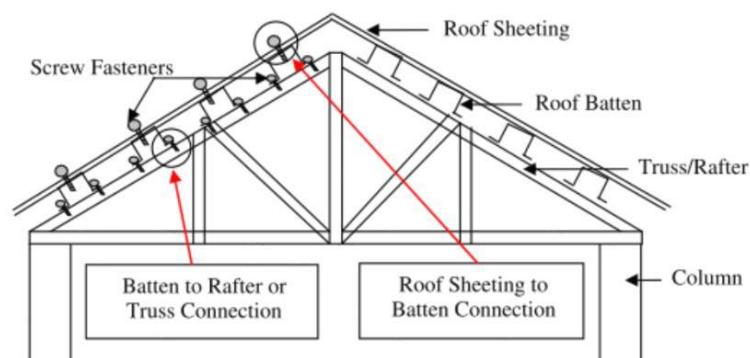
Roof structure component (Sivapathasundaram and Mahendran, 2016)
